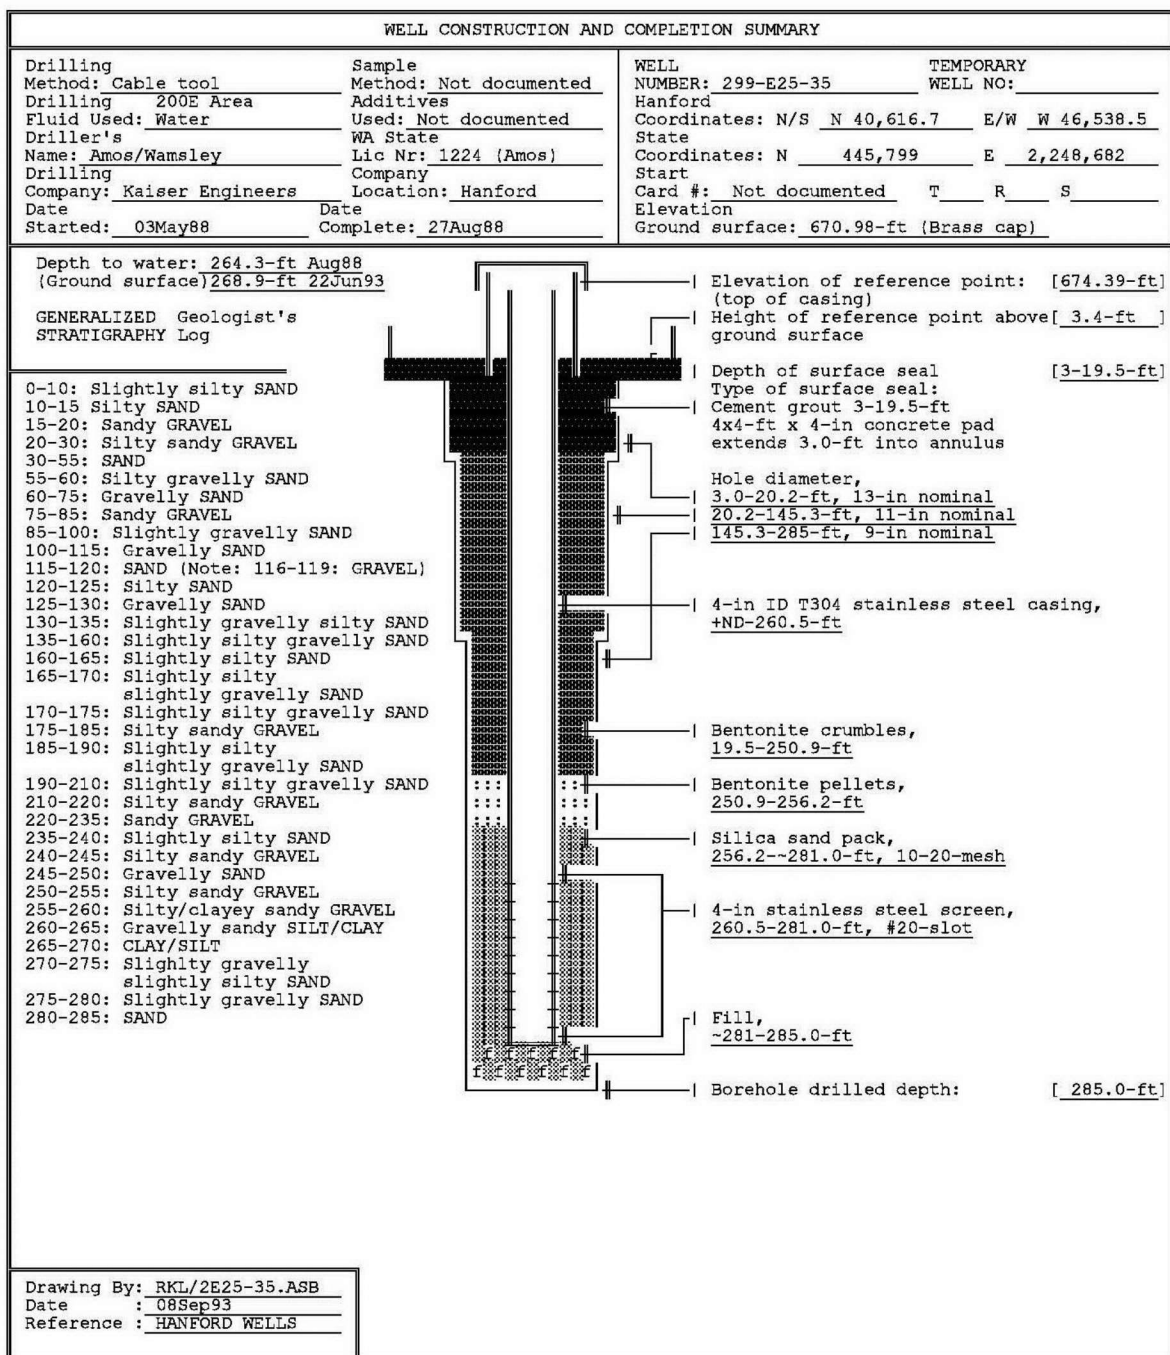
Well 299-E25-35 Construction and Completion Summary
